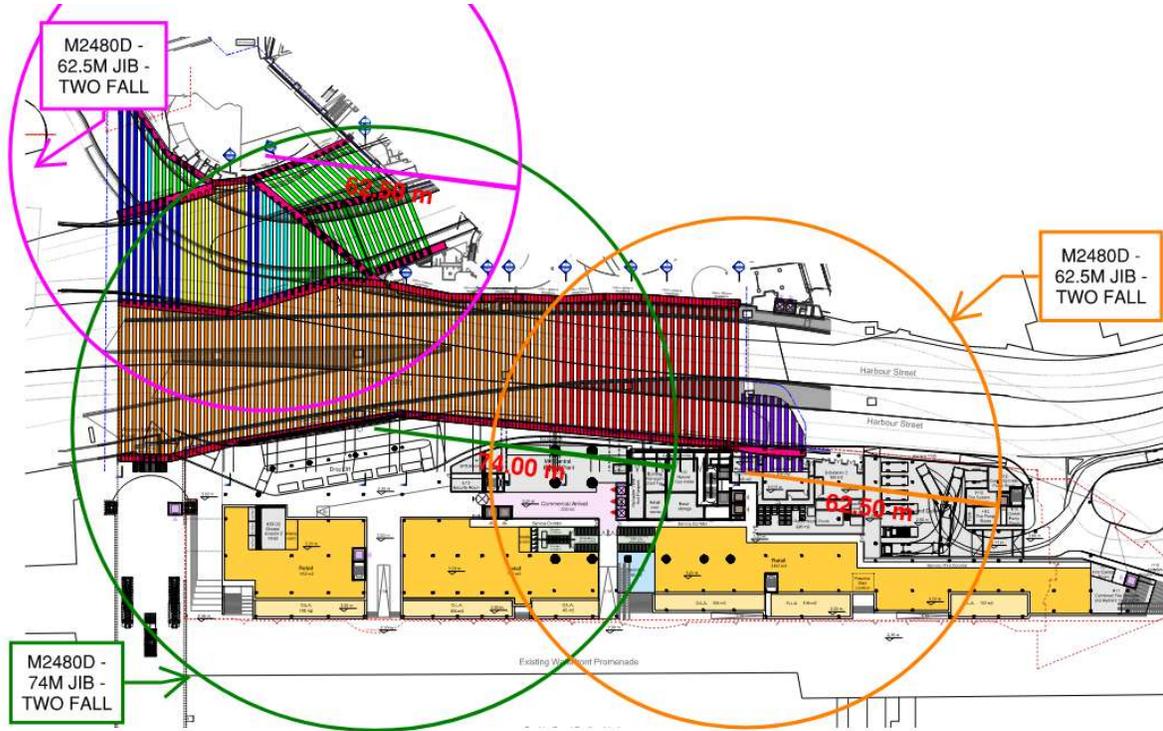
Cranes location (Source: Construction Management Plan, Multiplex)
